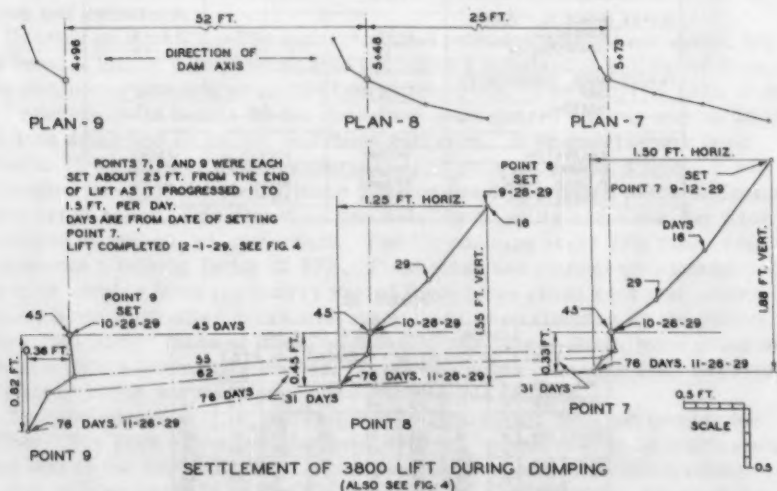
PROFILE, SECTION AND SETTLEMENT OF MAIN LIFT
